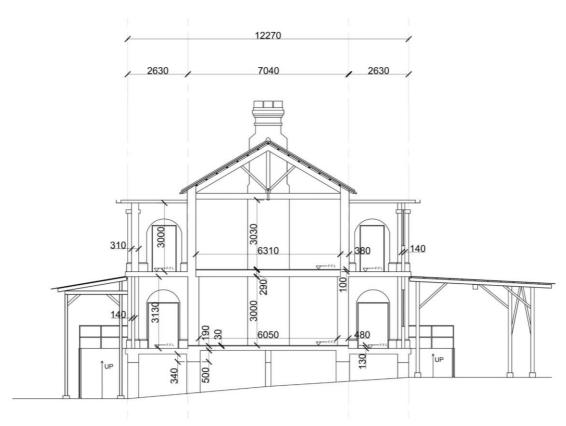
Cross section, nowadays. (Source: Architectural Services Department)
